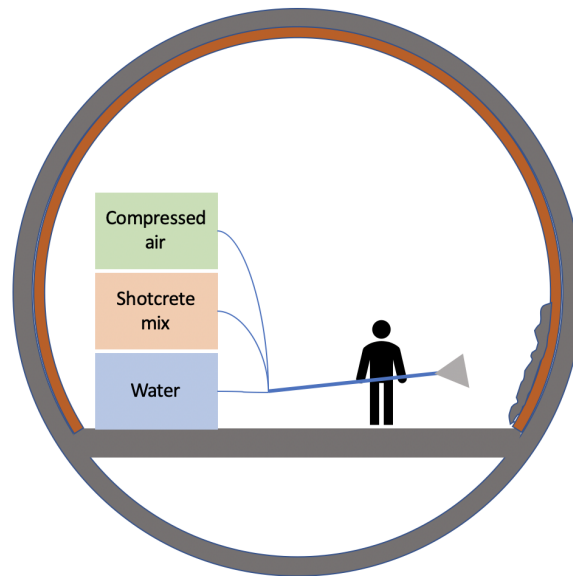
Schematic representation of the application process of shotcrete on steel reinforcement arches in tunnels (author’s own work).
